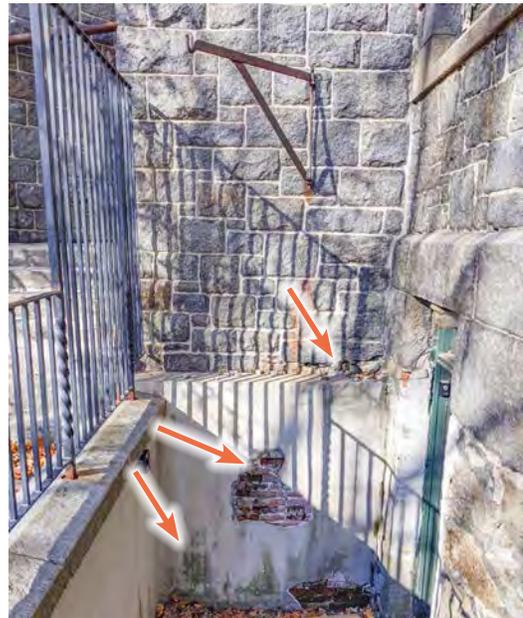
The areaway stair walls are damaged and stained with from the collecting water and snow.
